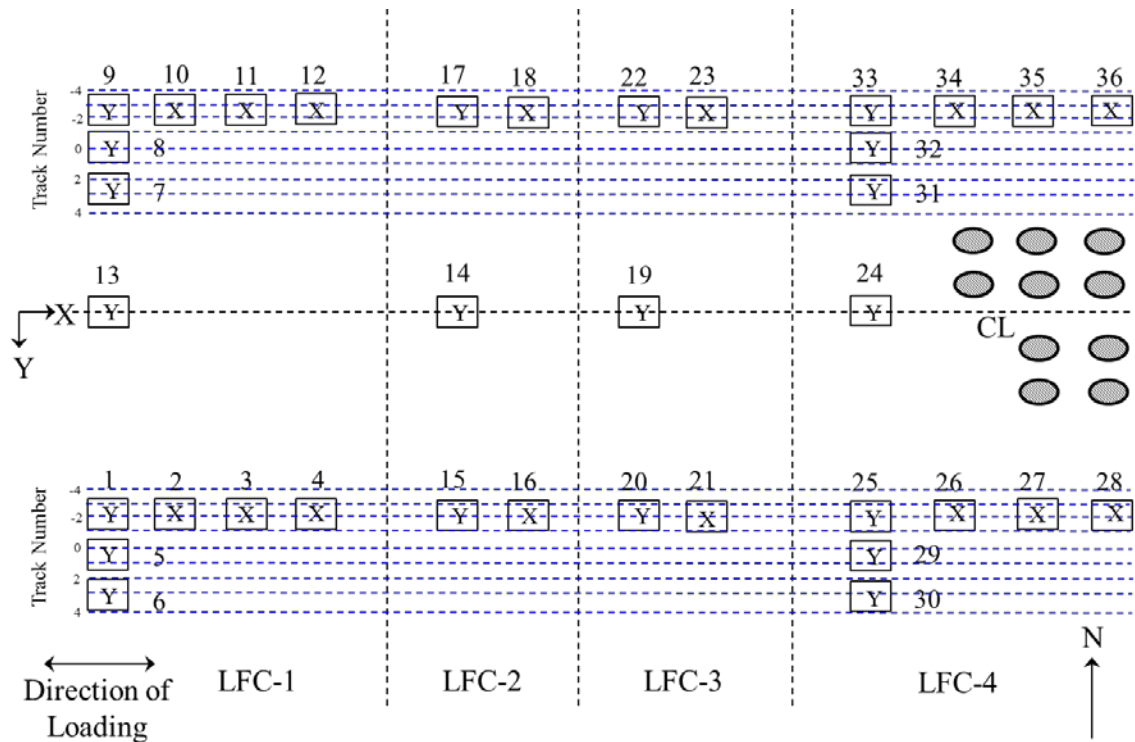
Locations of strain gage sensors in CC3 pavement (Plan view)
